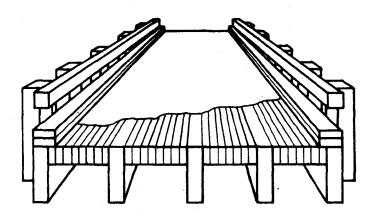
Stressed Tee Beam Bridge (Source: Barry Dickson, West Virginia University)
